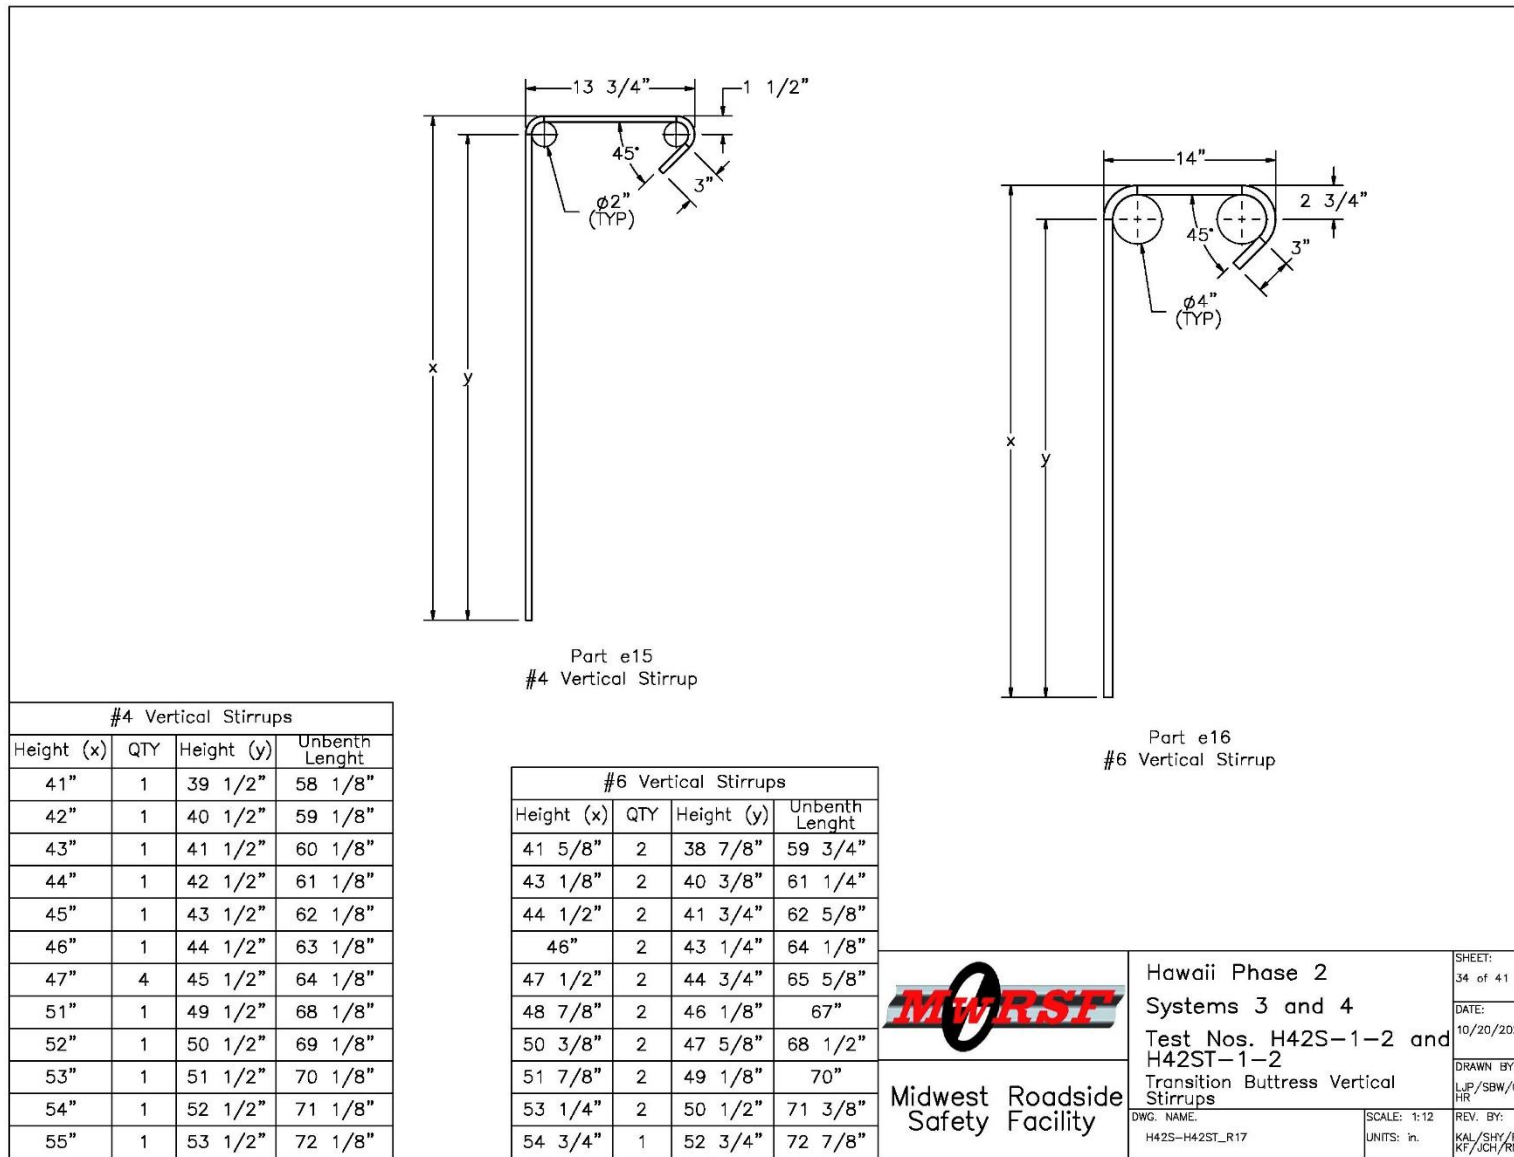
Transition Buttress Vertical Stirrups, Test Nos. H42S-1 and H42S-2
